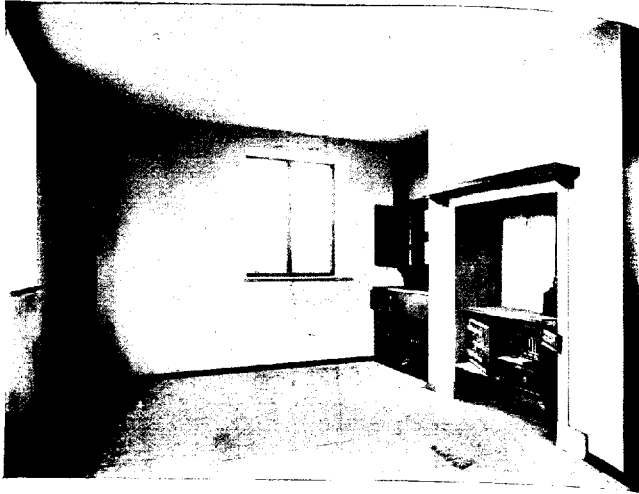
Chalk Cob Cottage. Corner of Living Room.
